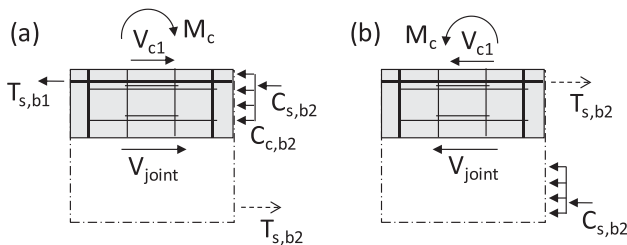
Forces acting at the joint – (a) interior joint, and (b) exterior joint.
